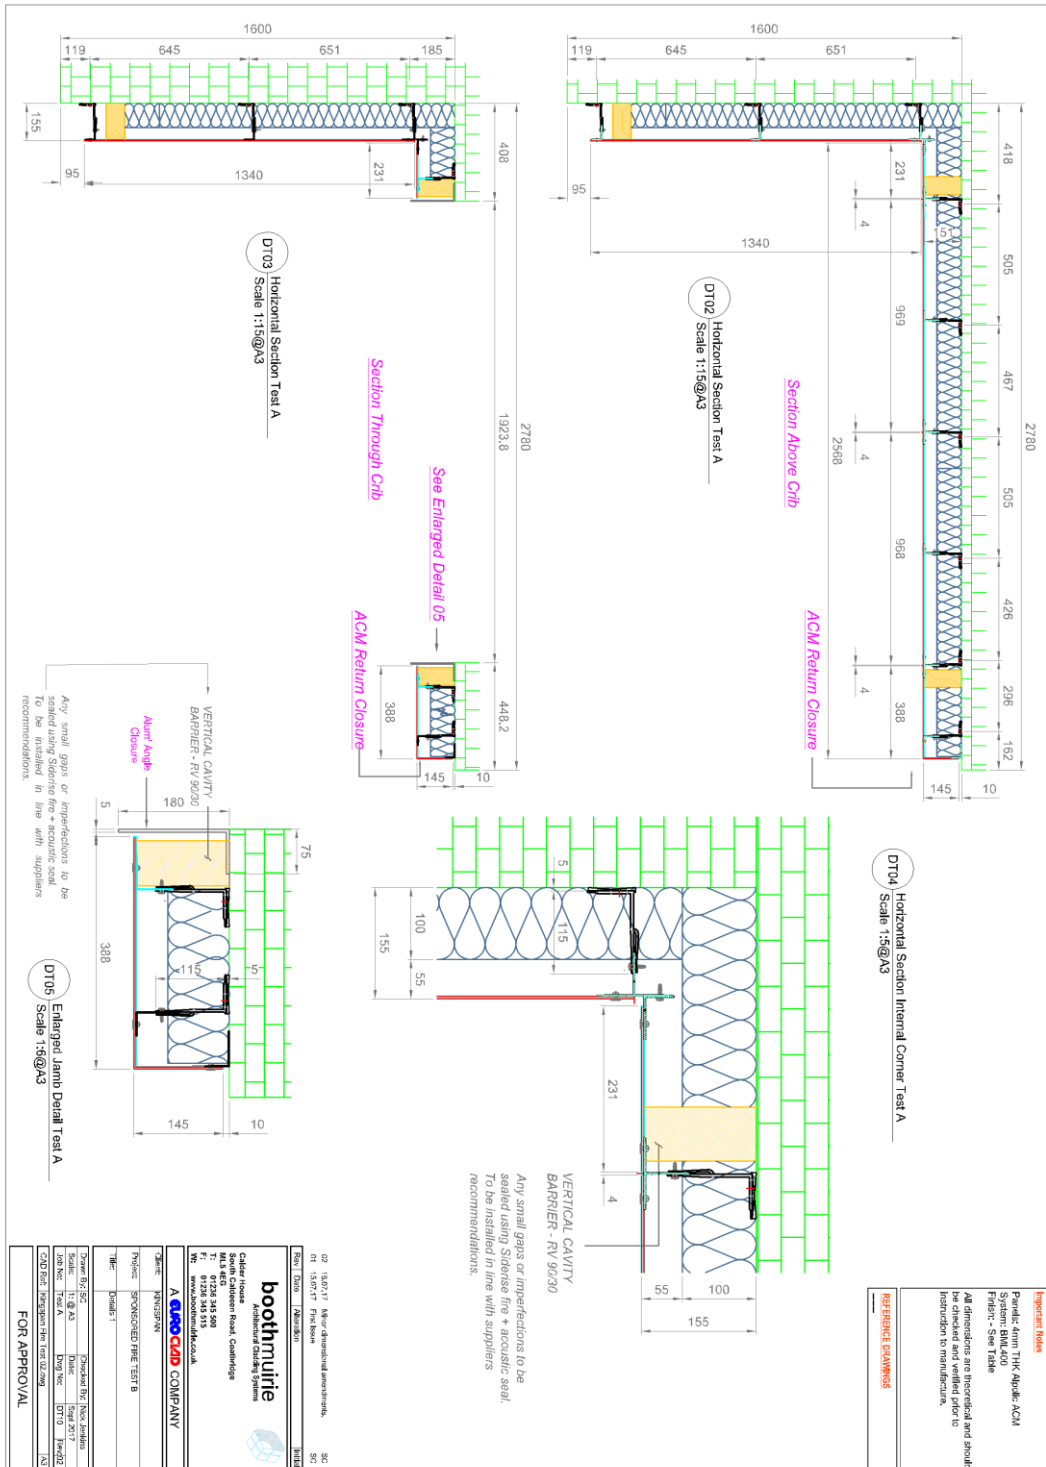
Cross sectional drawing. (Supplied by the test sponsor).
